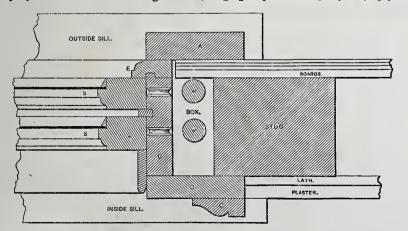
T. H. S.'s Construction in Frame Buildings.
